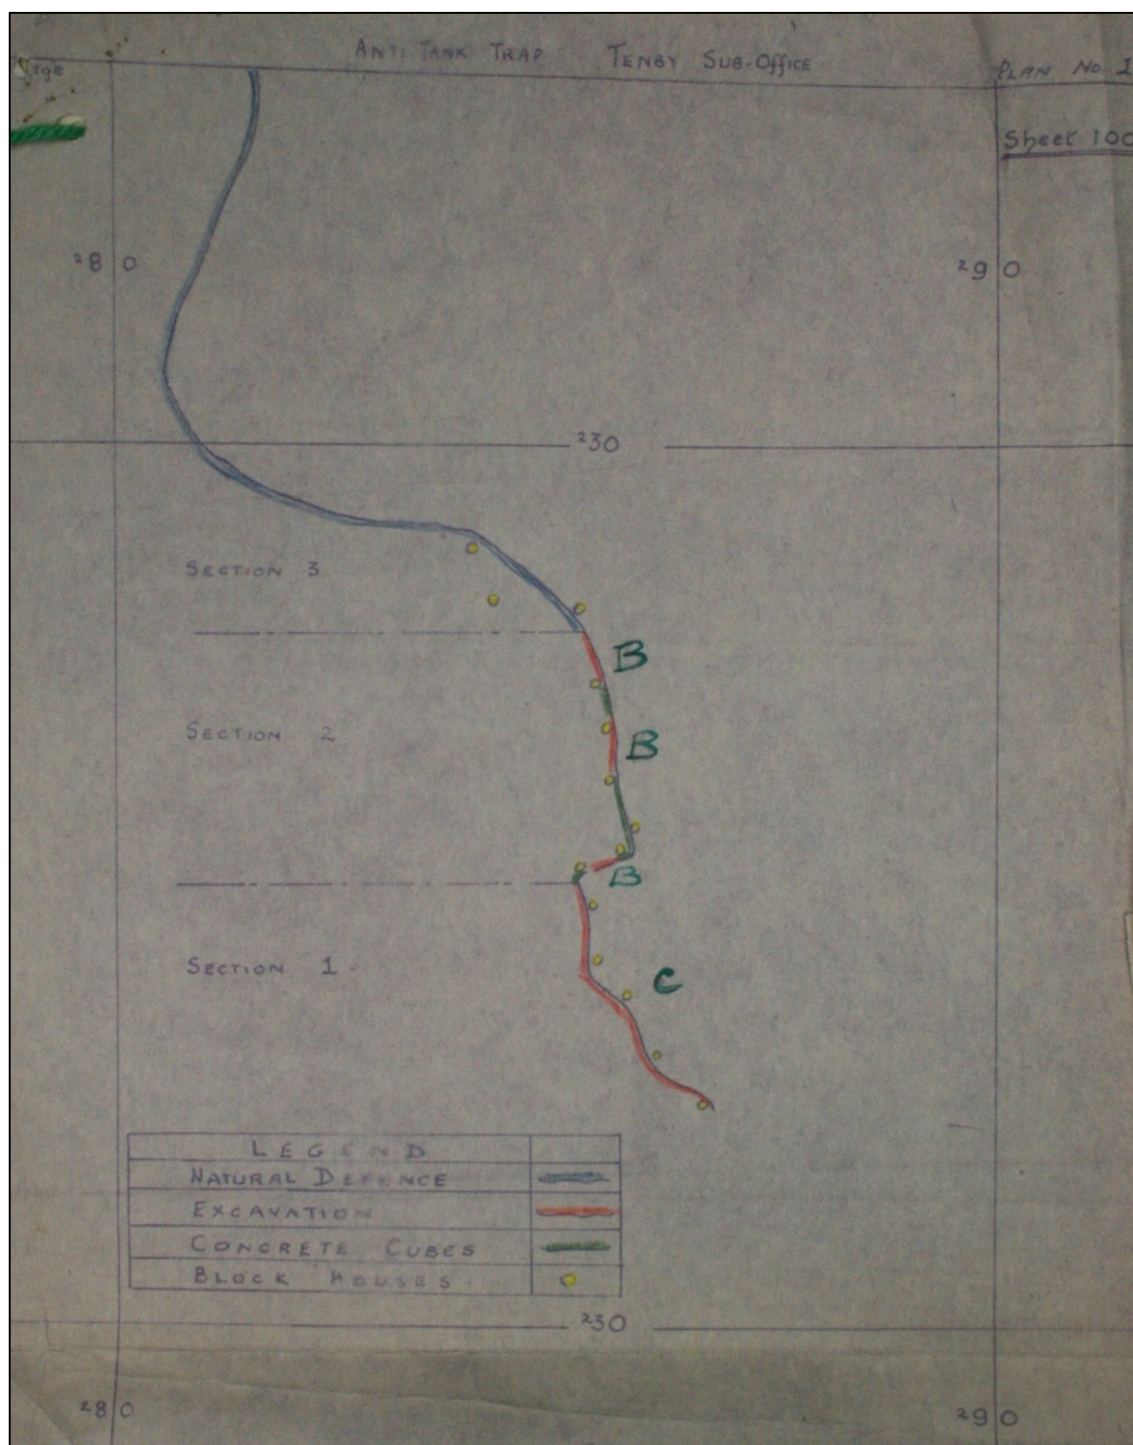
Plan depicting natural defences, excavation, concrete cubes and block houses for southern (Pembrey-Ferryside) section of Carmarthen Stop Line (TNA MAF 112/204).
